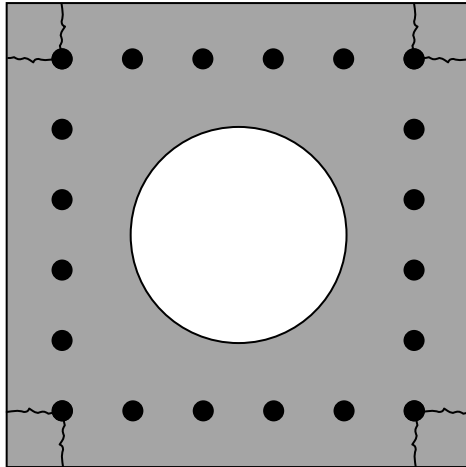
Cracking and delamination pattern on the cross-section in splash and tidal zone
